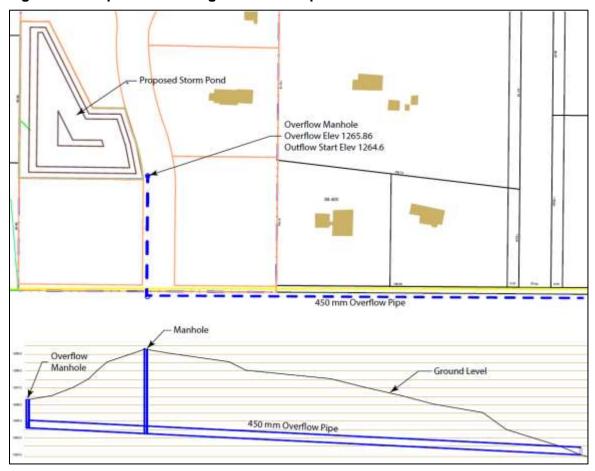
Proposed Discharge/Overflow Pipe Schematic
